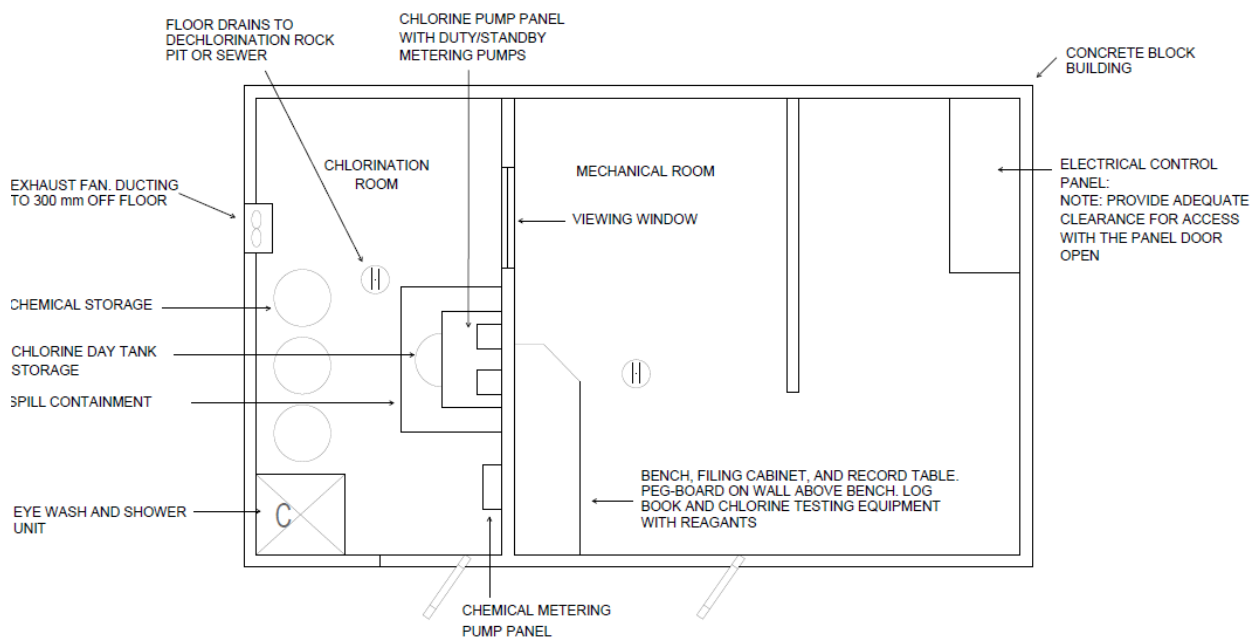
Example well pump, chlorine and control building layout, showing details for chlorination room (sourced from Design Guidelines for First Nations Water Works, ISC, 2006)
